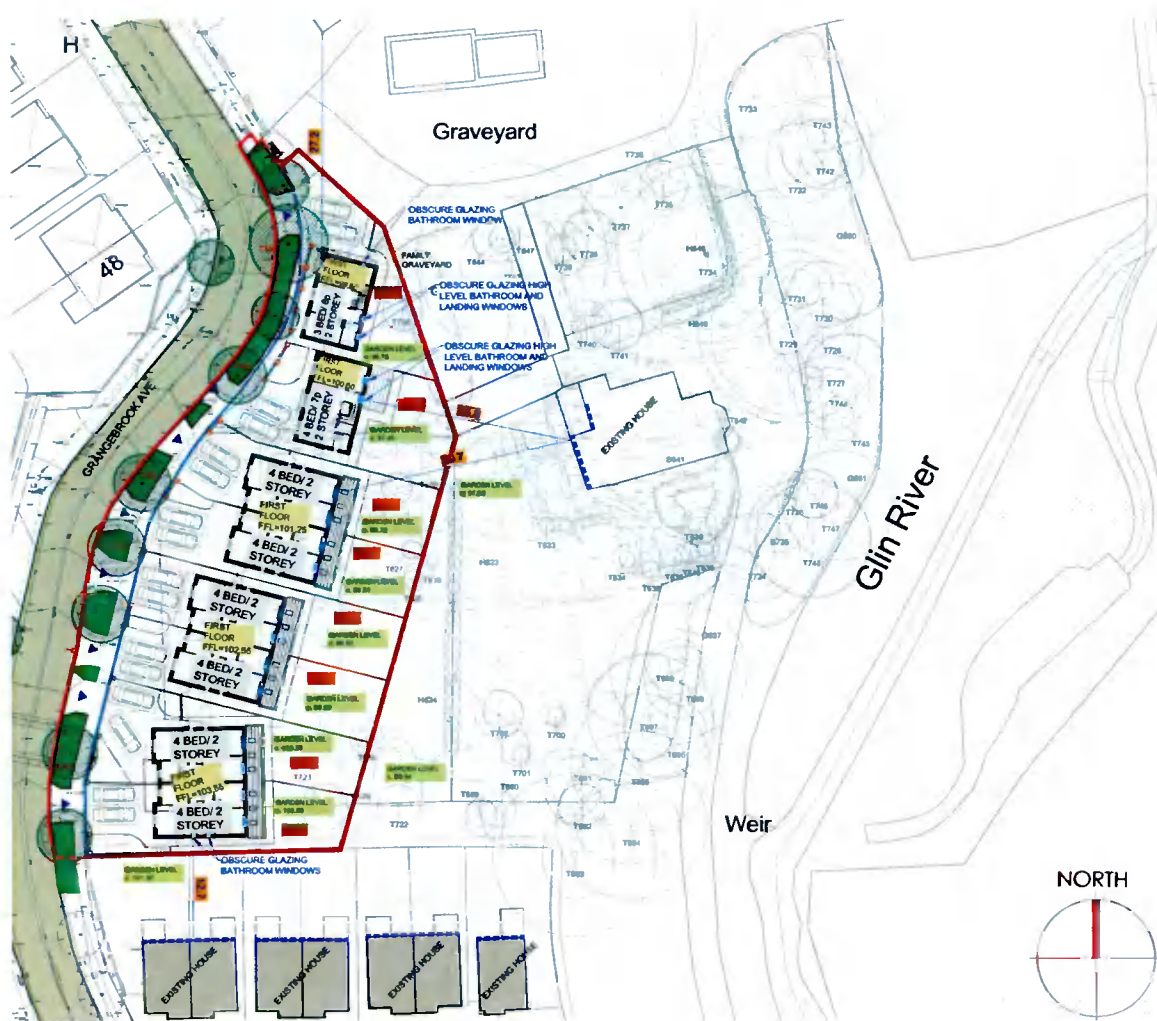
Site Plan showing rear facing windows at first floor of proposed new houses, in relation to Whitechurch Graveyard and Palmyra
